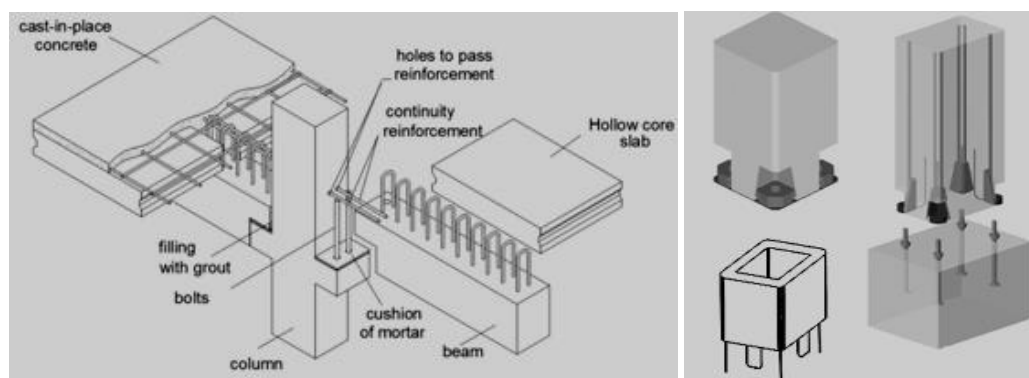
Connections (a) Beam-Column Connection & Slab to beam Connection [19]
